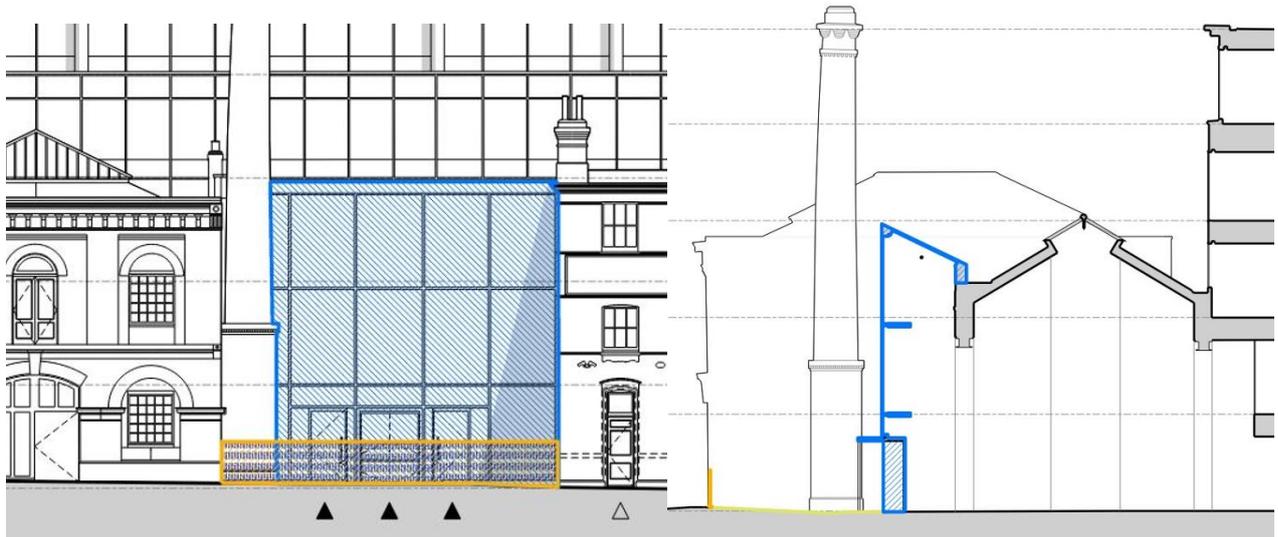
Extent of structures removed adjoining listed building at 34b York Way (Elevation and Section)
